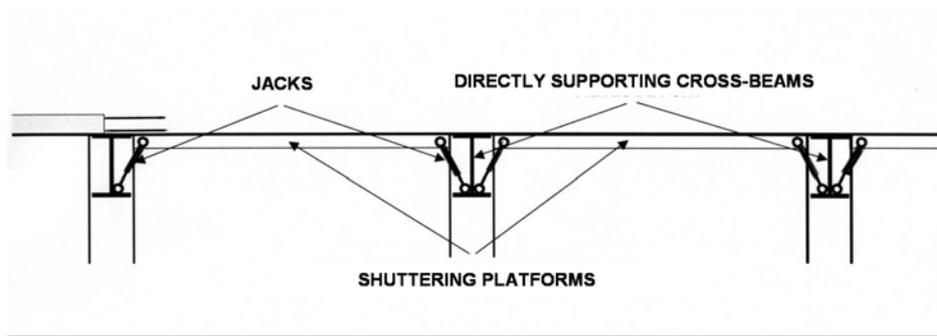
Shuttering platform bearing conditions in steelfixing/concreting position (reinforcement of casting section under construction not shown)
